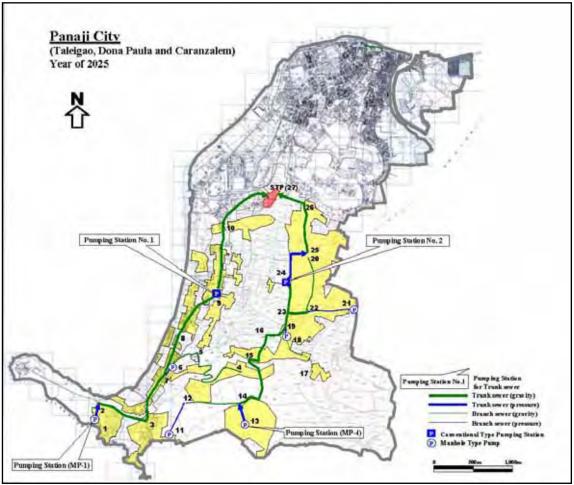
Proposed Sewerage Service Area of Panaji Surroundings
